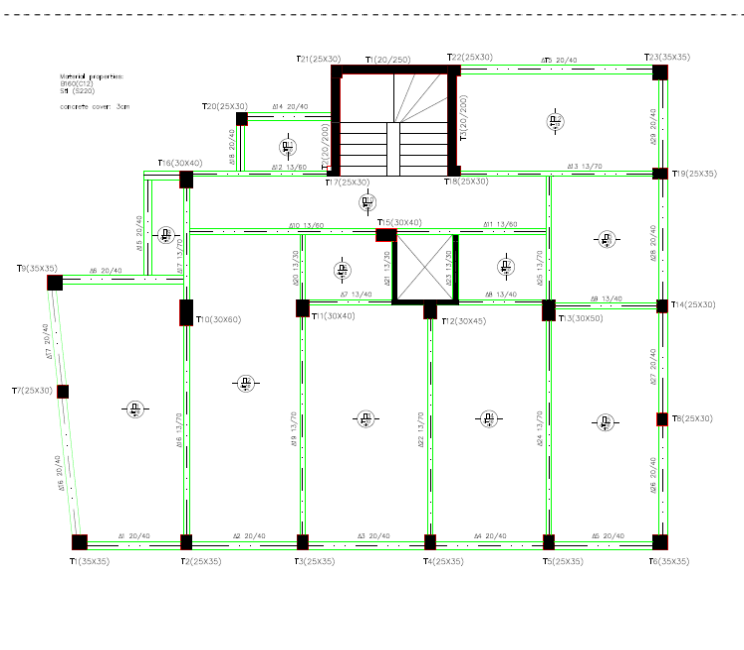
(b). Representative floor plan layout of the existing multistorey building (case study).
